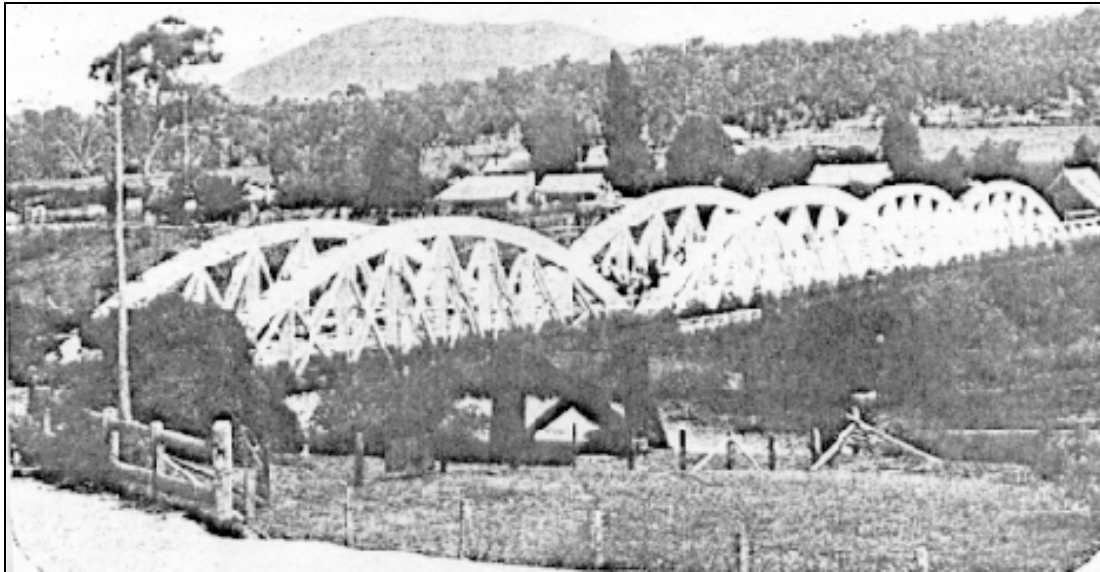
1874 laminated timber arch bridge at Bendemeer.
